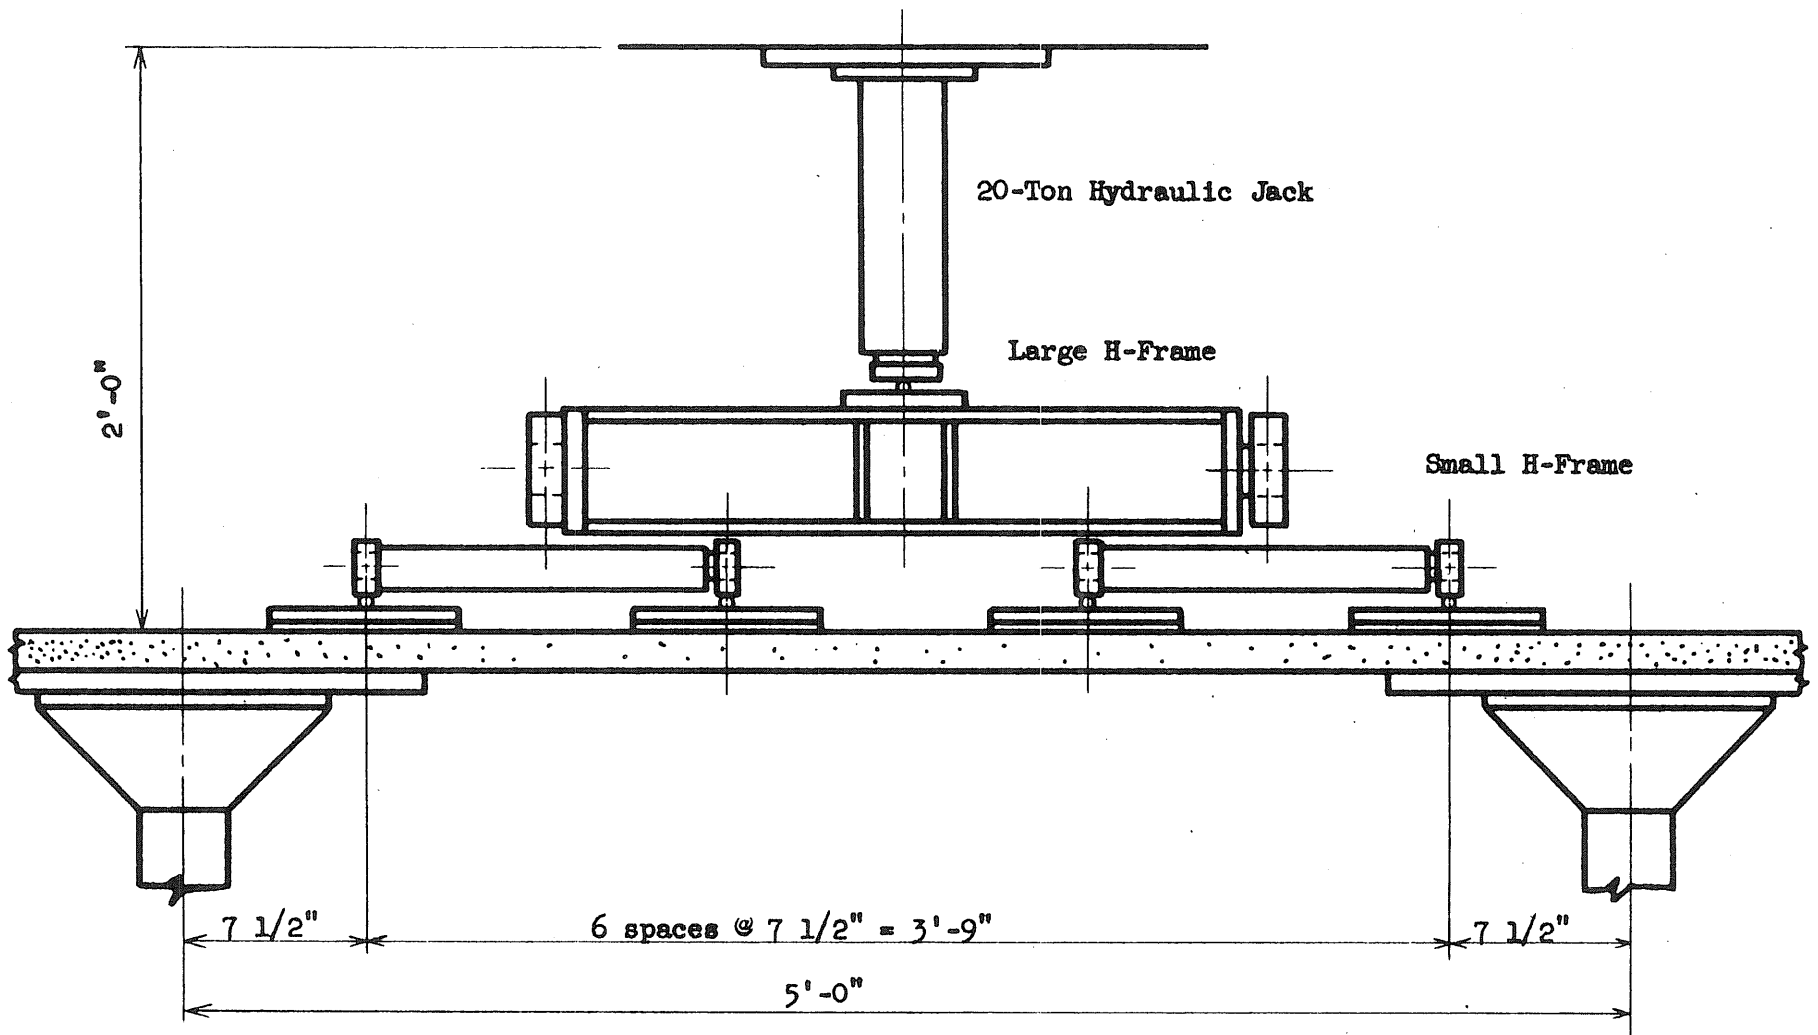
ELEVATION OF LOAD DISTRIBUTING SYSTEM
